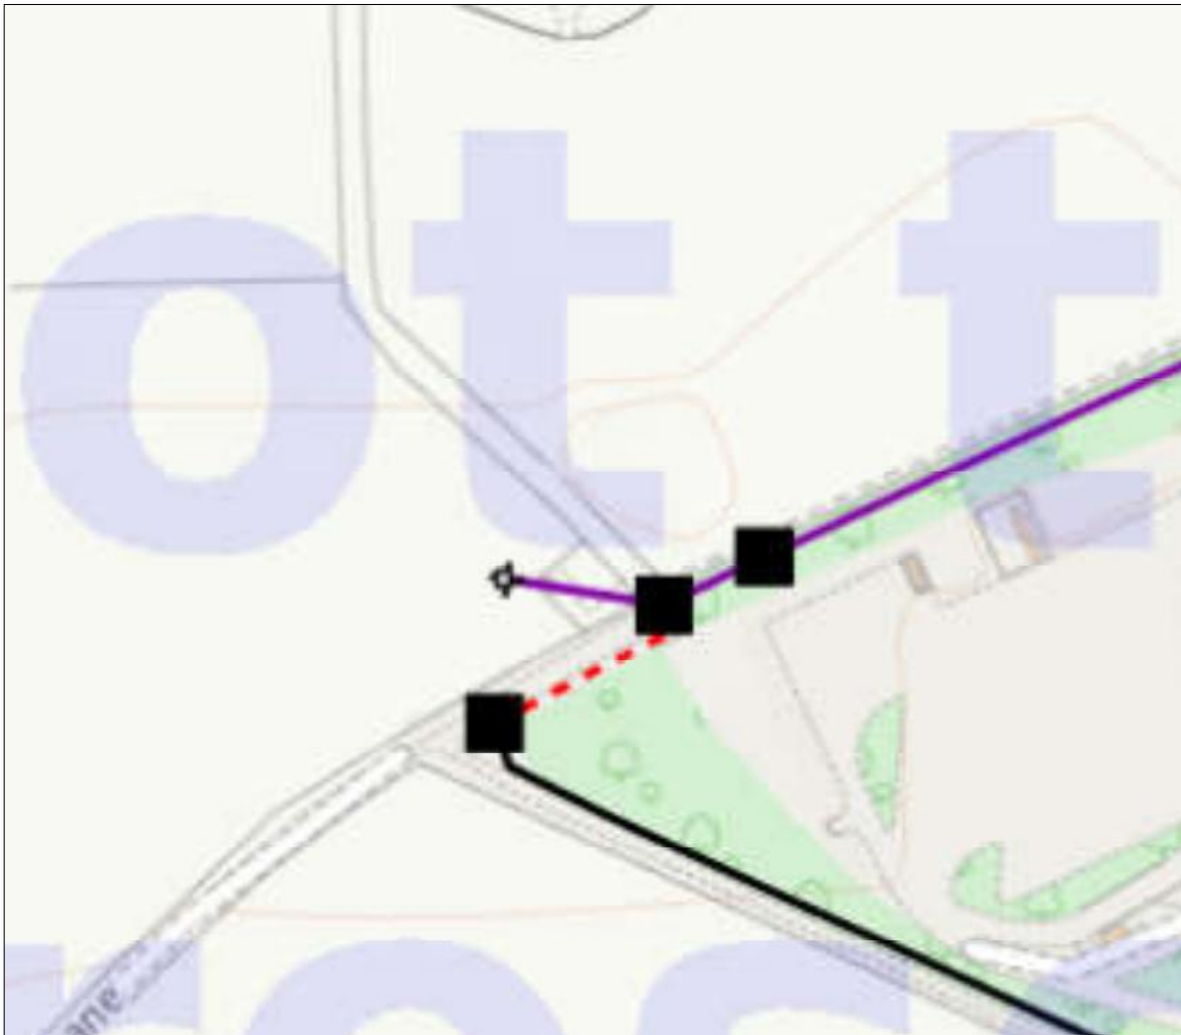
Existing underground ducts and chambers with Donington Service Station
